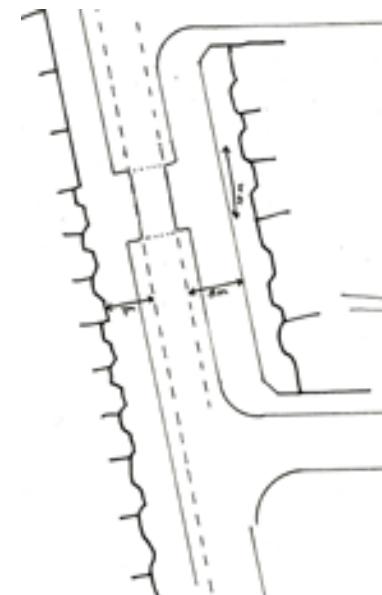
principle 2 - widening sidewalk on two sides of the road
